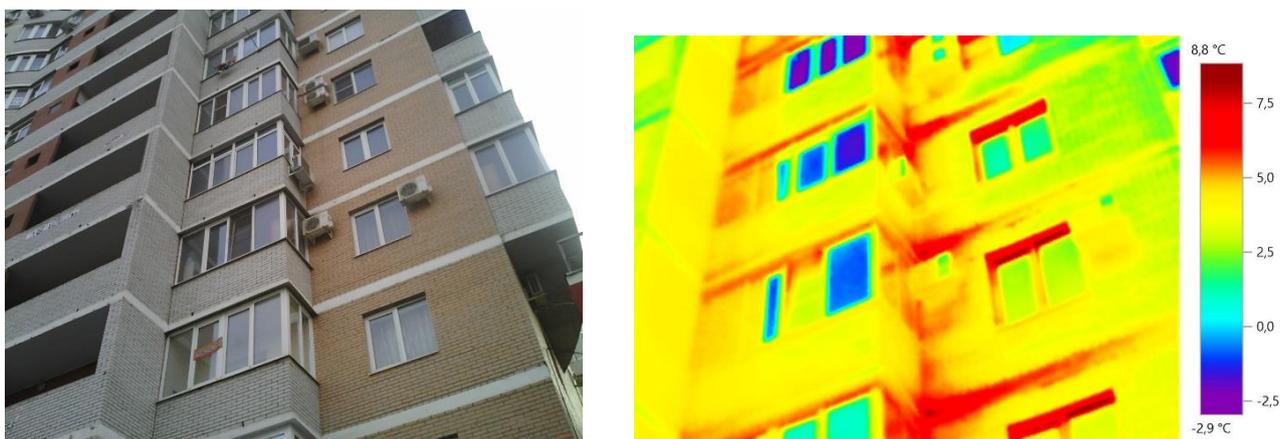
Fragment of the facade of a building not equipped with a ventilated facade
